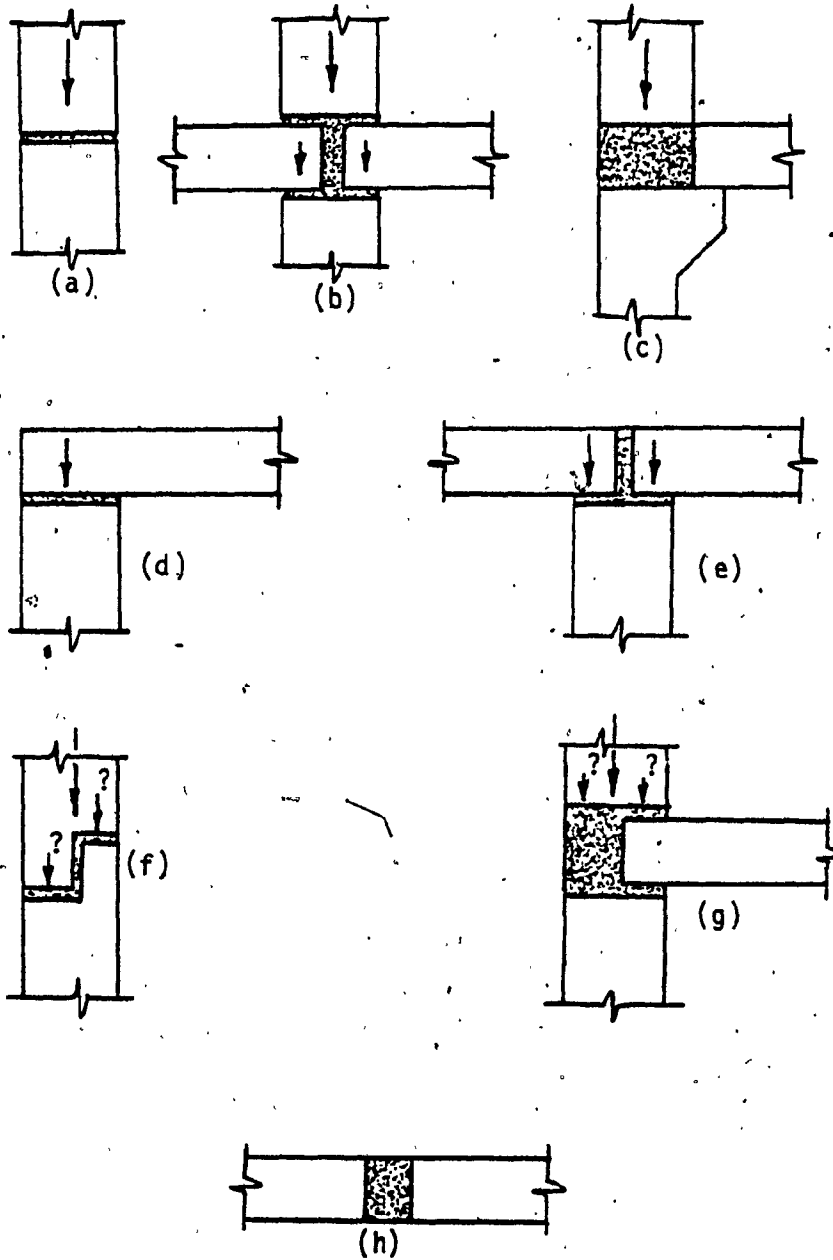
HORIZONTAL JOINTS - VERTICAL SECTIONS
